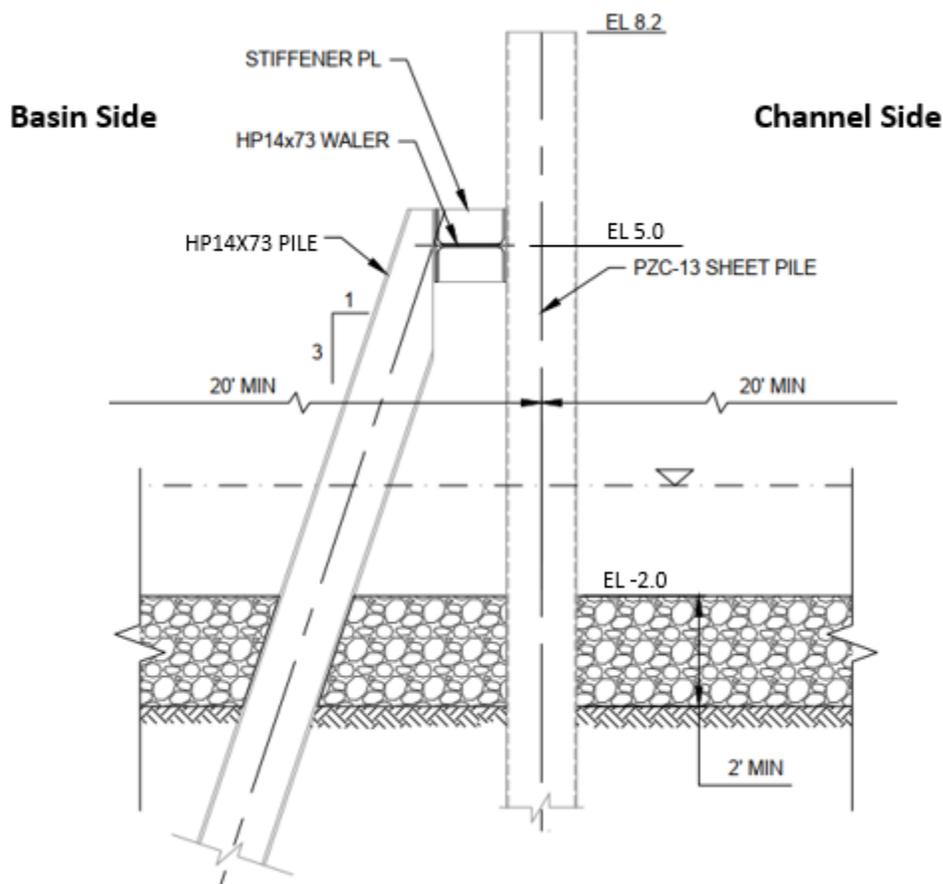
OTF Braced Guide Wall Typical Section
